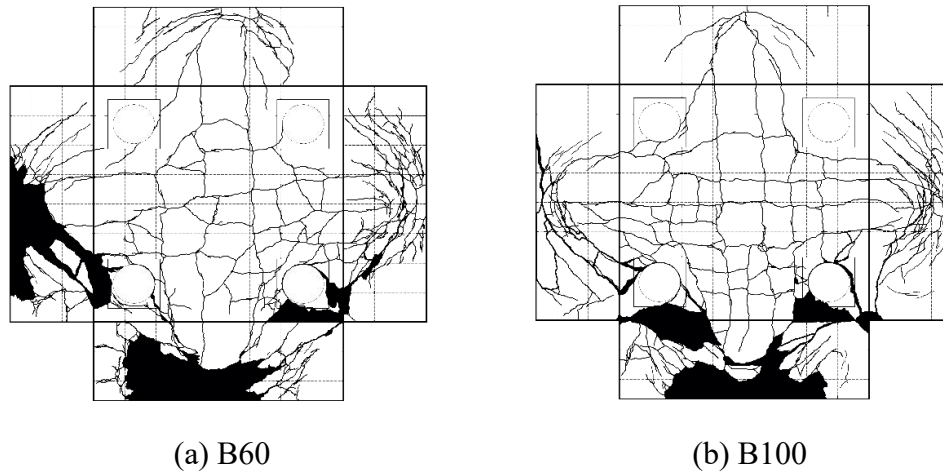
Post-failure cracking maps of drilled shaft footing specimens
